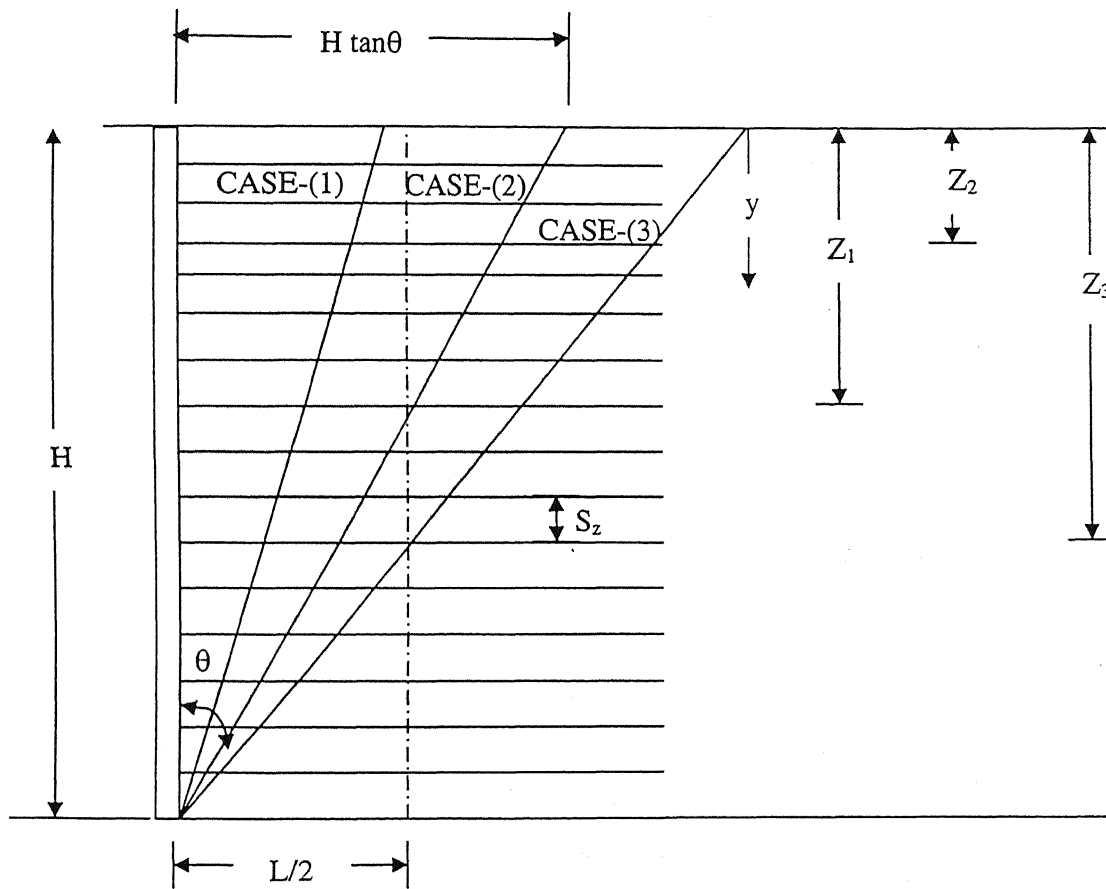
(b): Schematic representation of three cases of analysis (cantilever retaining wall)
